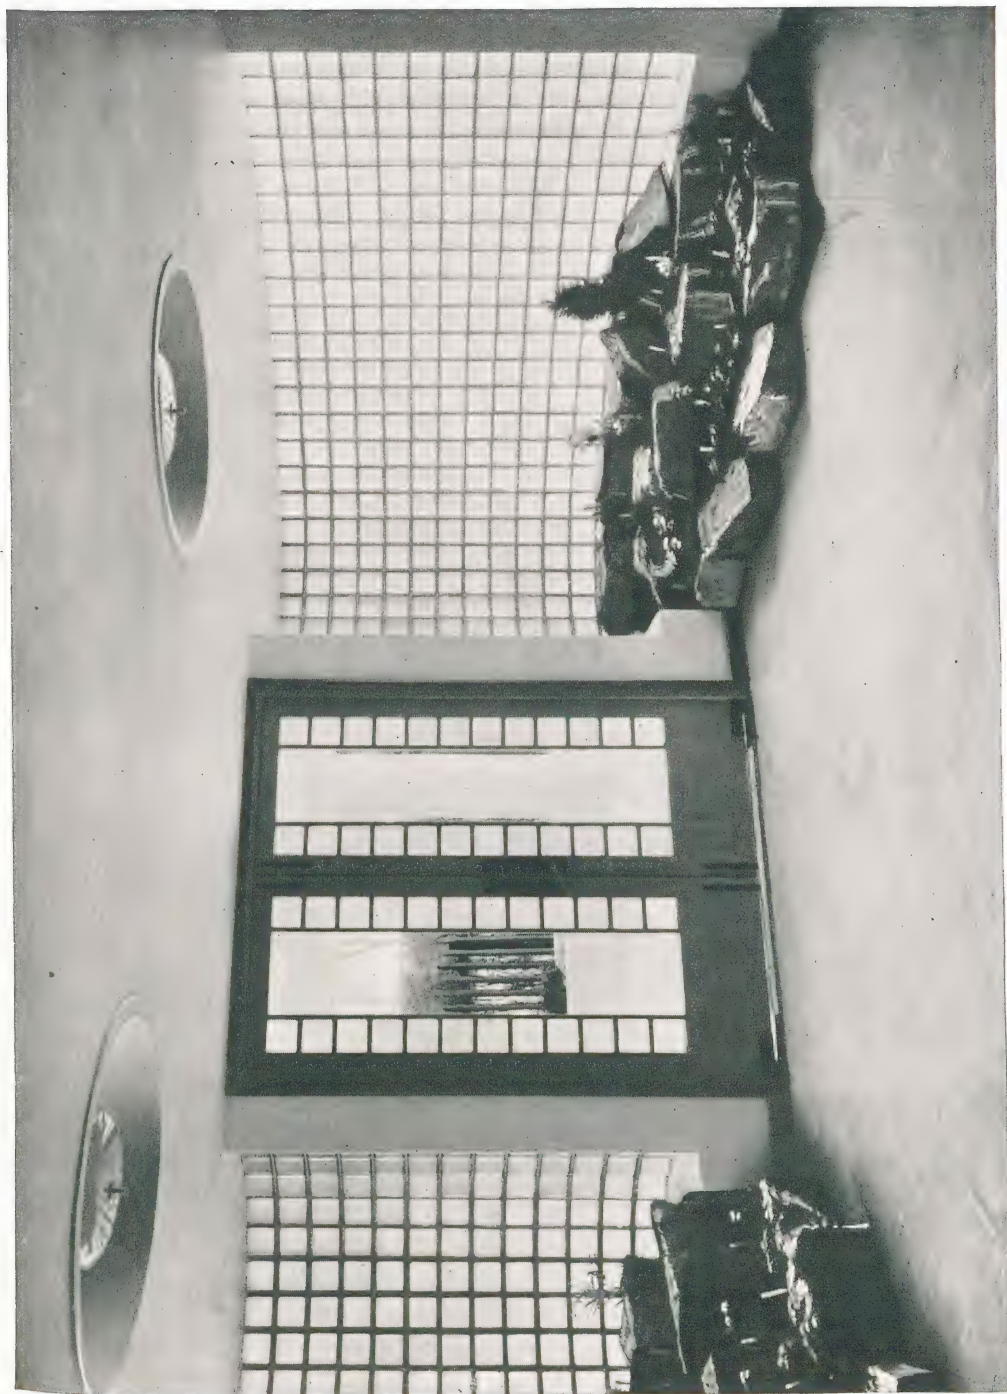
A MODERN ENTRANCE HALL WITH GLASS BRICK WALLS.
